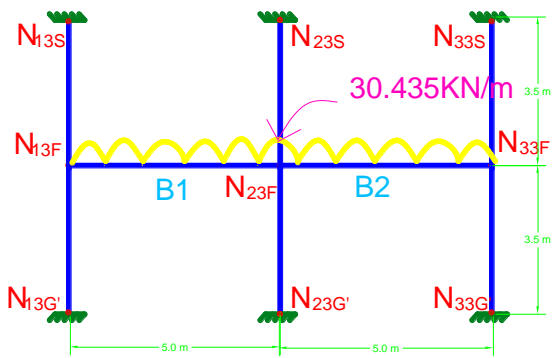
Substitute Frame -1 for the First Floor Beam B1 - B2 (FSF1)
